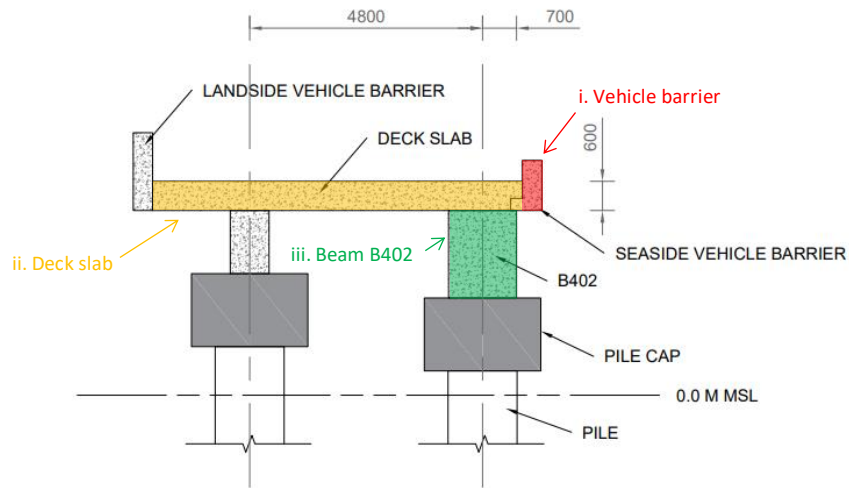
A simplified cross-section of a portion of the Matola jetty, adapted from the drawings provided by PRDW.
